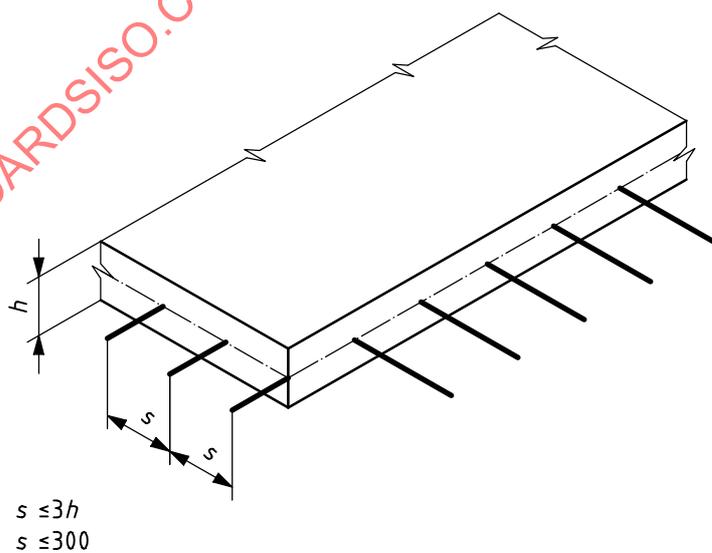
Spacing between shrinkage and temperature reinforcement in slabs
